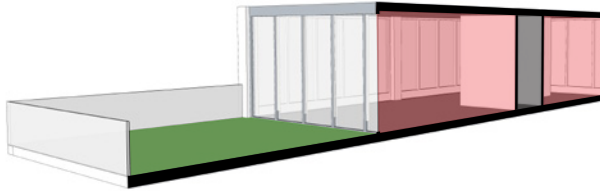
typical 1 - 2 bedroom apartment.
